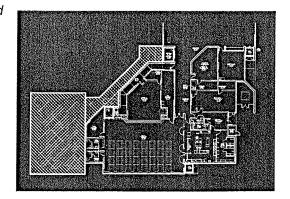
Proposed Gymnasium Addition approx. 4,700 GSF.
